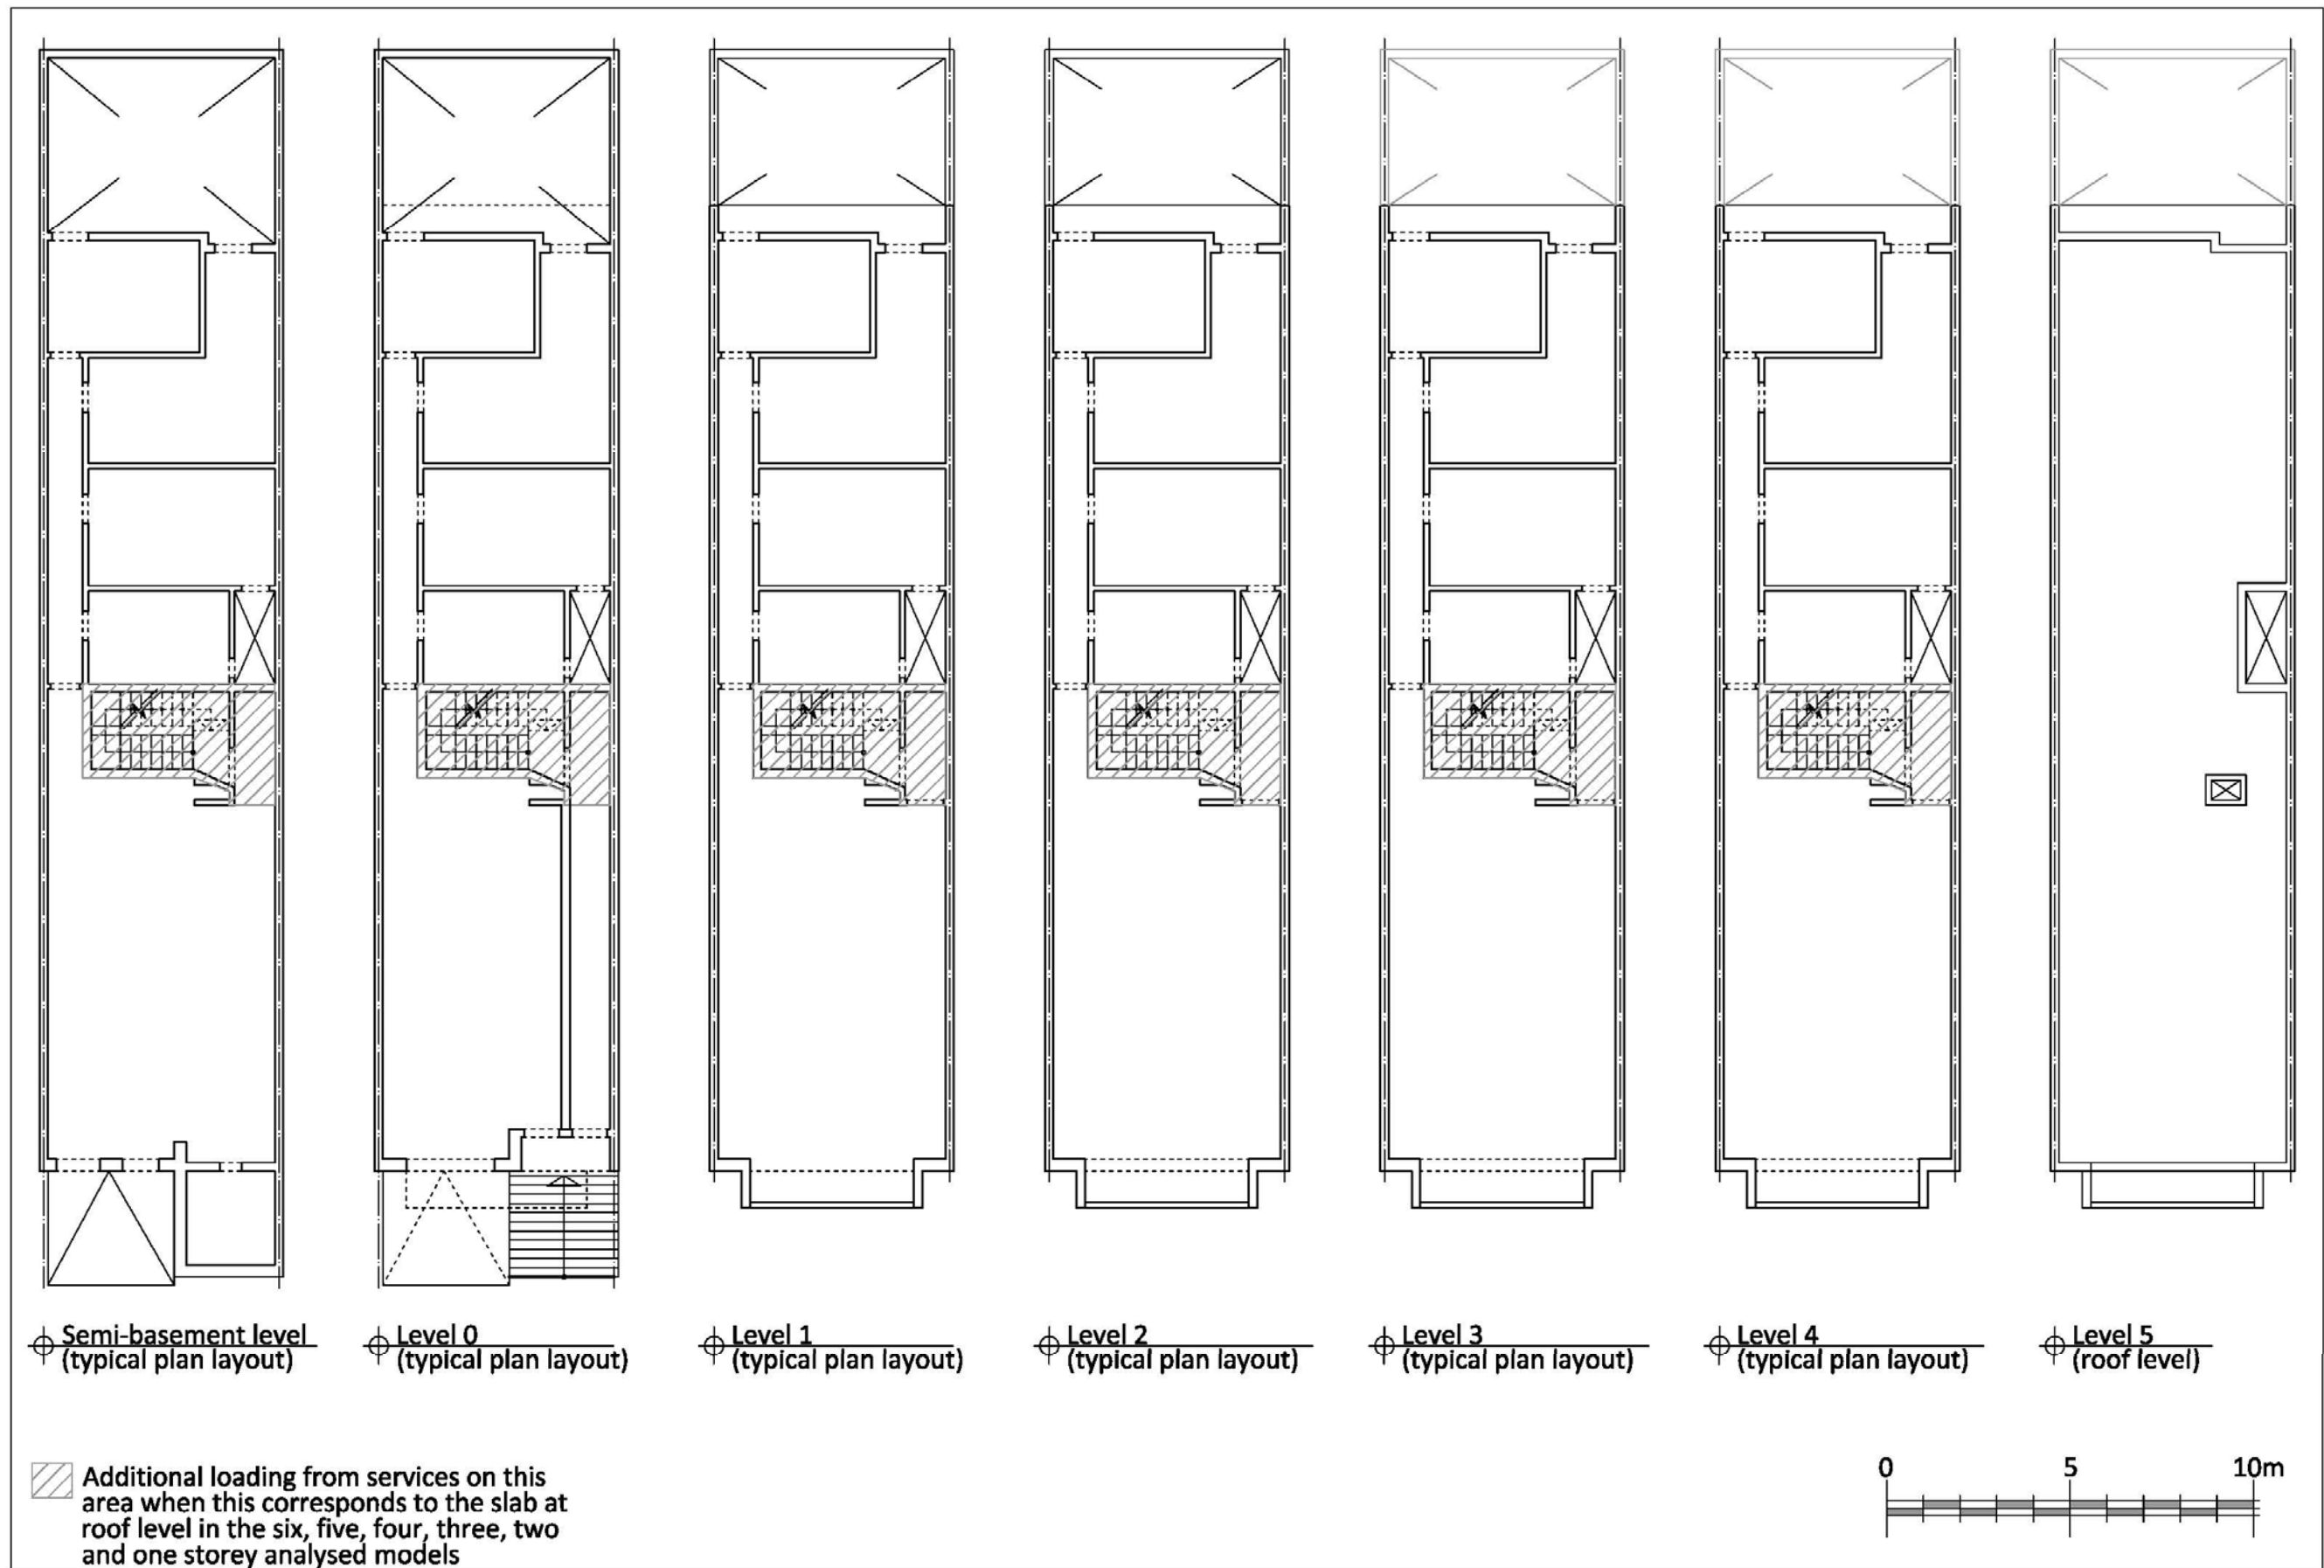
Plan layouts at all levels for analysed single building control numerical models with extended plan layout proportions (plan length-to-width ratio 4:1).
